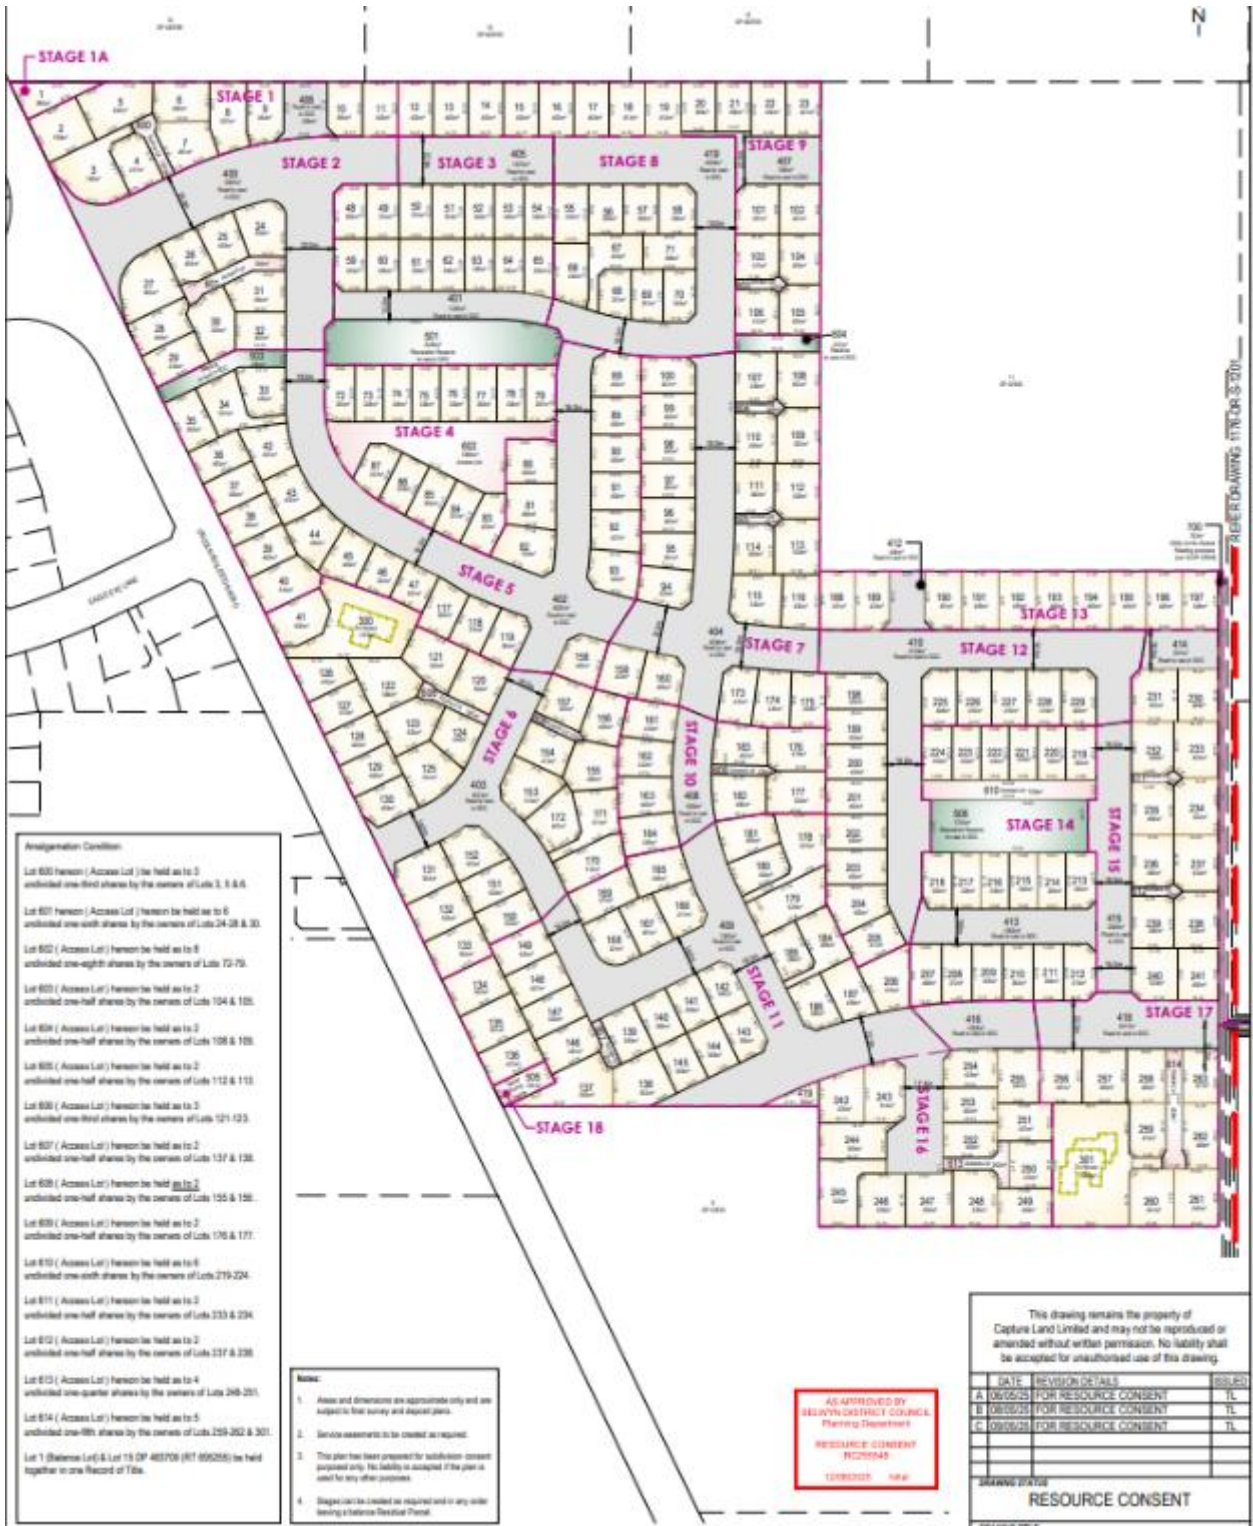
Approved subdivision plan of RC245401 as varied by RC245548.
